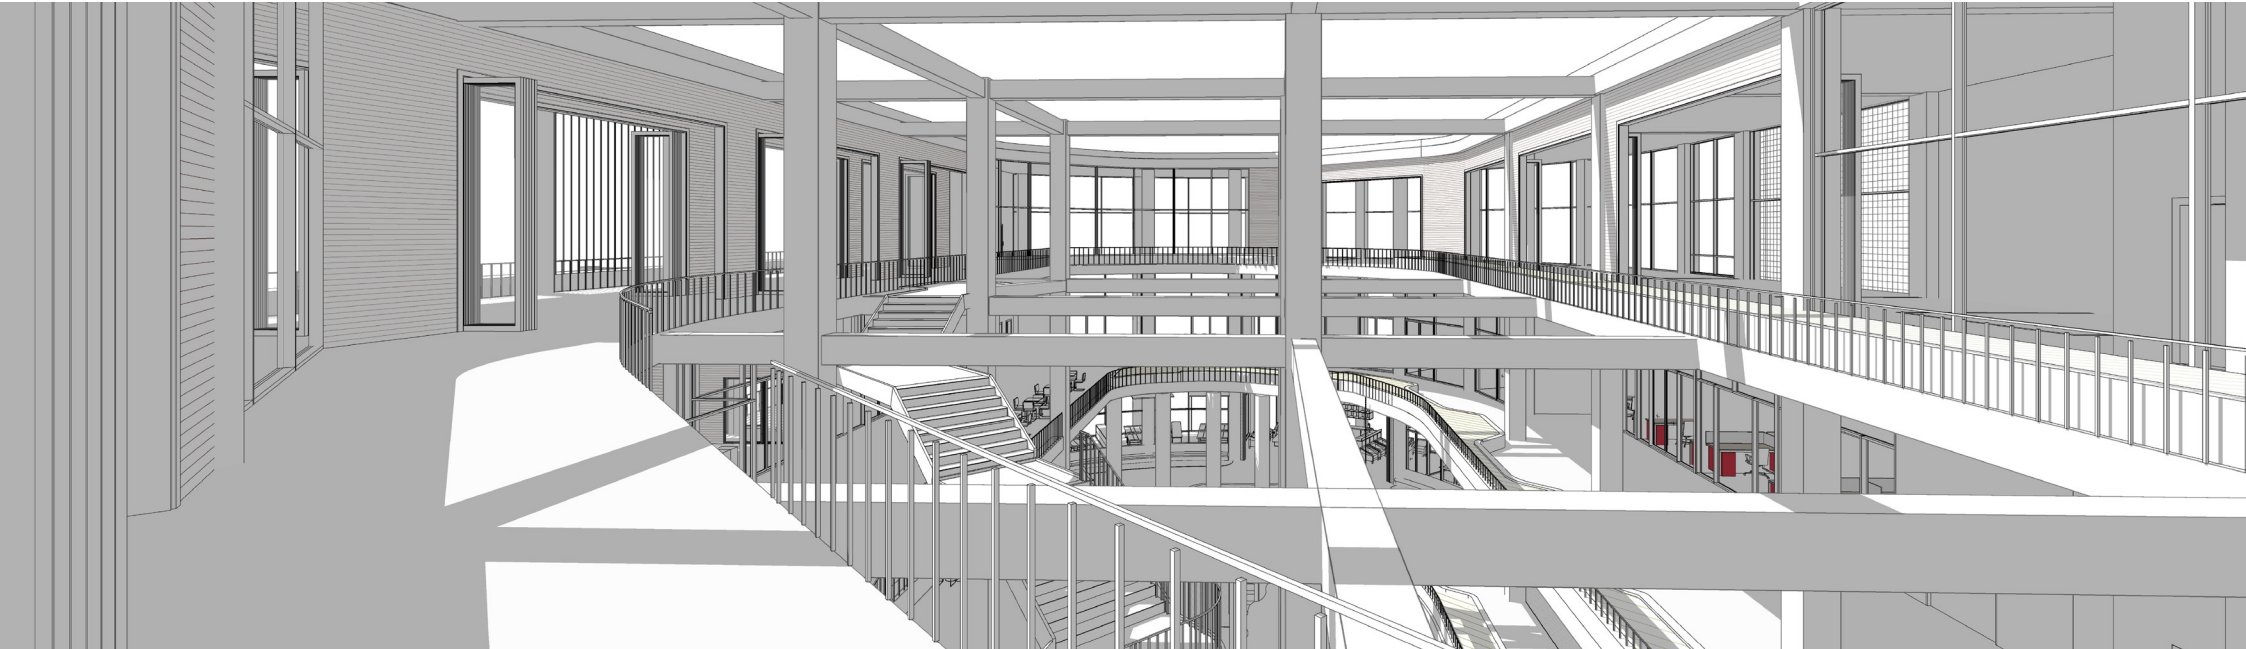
THIRD FLOOR CENTRAL VOID VIEW (AUTHOR 2021)
